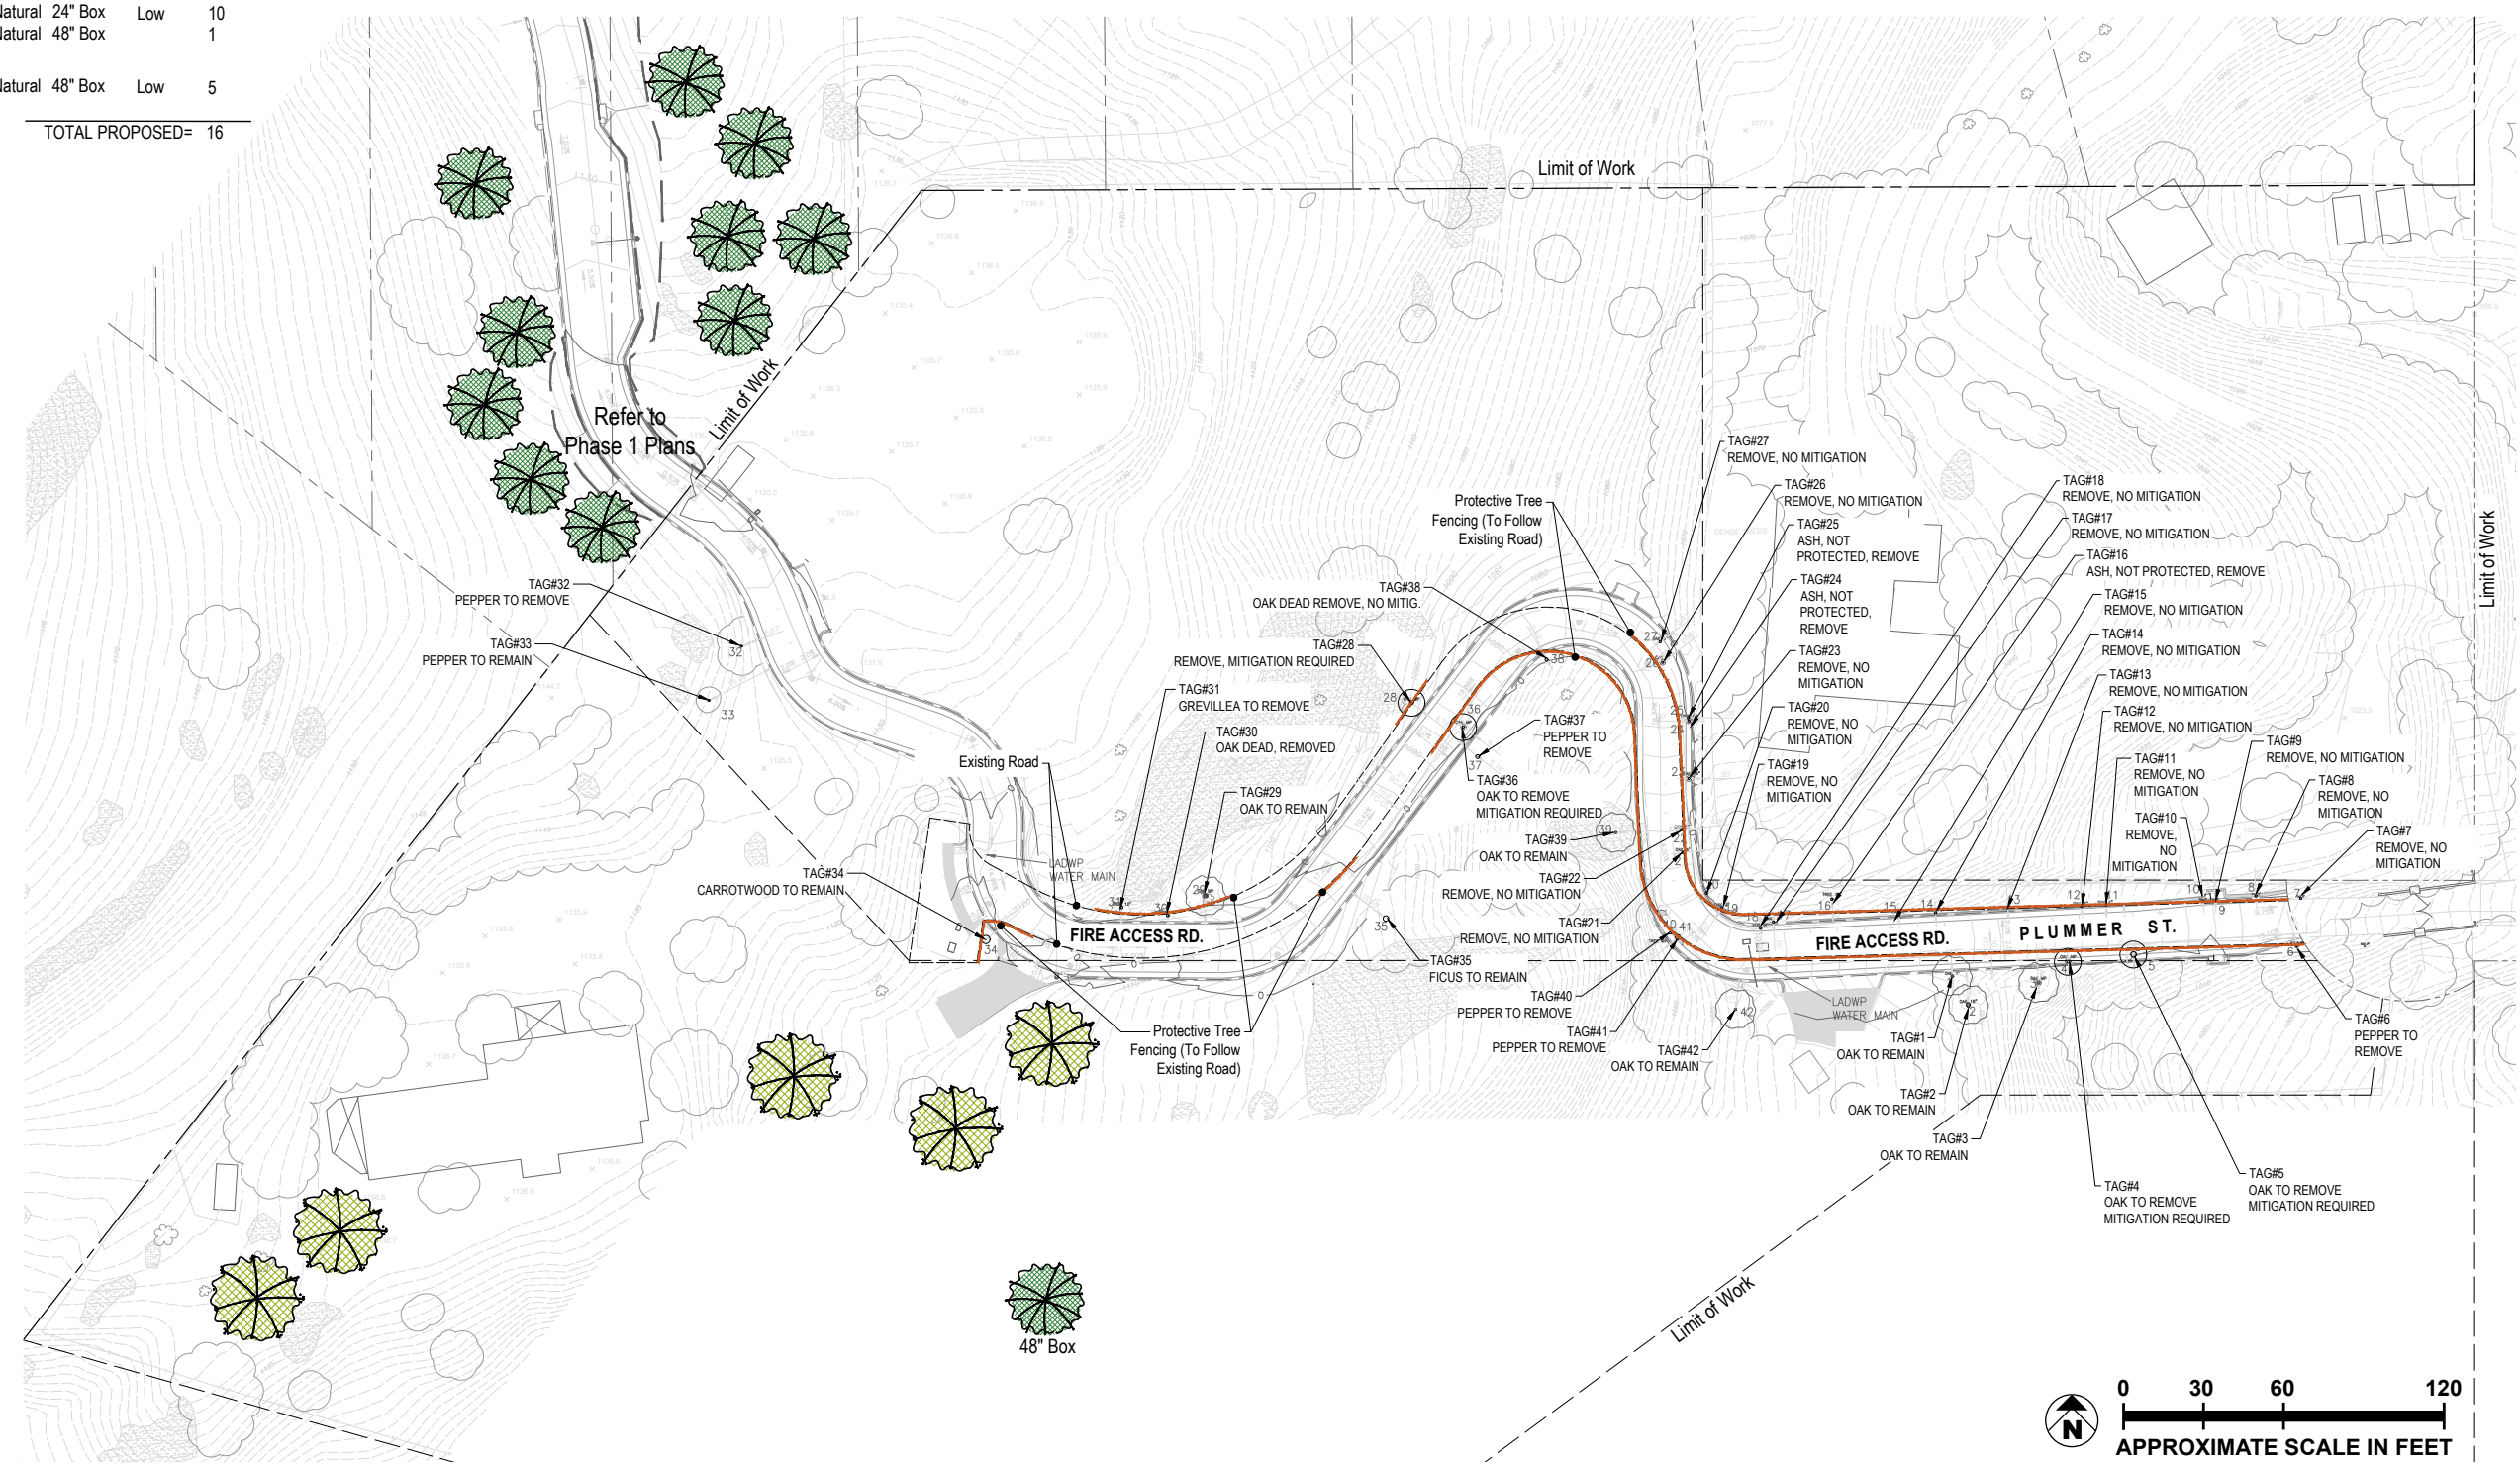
, Tree Preservation and Replacement Plan – Secondary Access Road, shows the improvements to the off-site secondary access road and identifies trees along the alignment of this road to be retained and trees proposed for removal. The improvements to the off-site secondary access road require the removal of thirty-two (32) additional trees, including nine (9) non-Protected Trees, eighteen (18) previously planted trees that are not naturally occurring, four (4) living Protected Trees (Coast Live Oaks) and one (1) dead Protected Tree (Coast Live Oak). LAFD determined that the proposed removal of these trees is necessary to allow for the construction of the off-site secondary emergency access road required for the Project.
